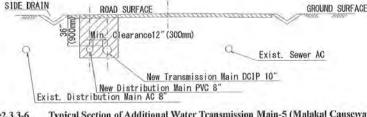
,3-6 Typical Section of Additional Water Transmission Main-5 (Malakal Causeway
